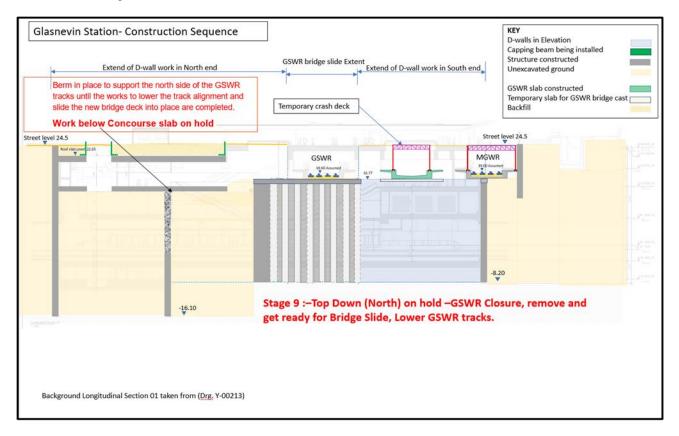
Work below Concourse slab on Hold as Berm in place to support GSWR tracks
